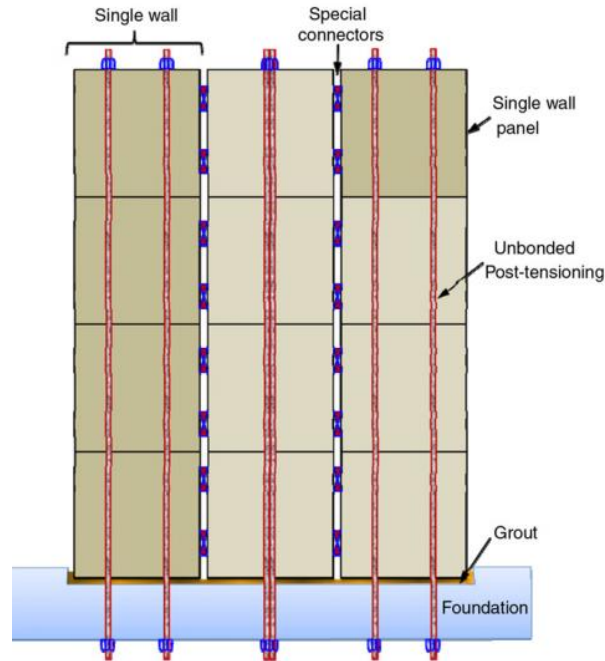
A jointed wall system (Aaleti and Sritharan 2009)
